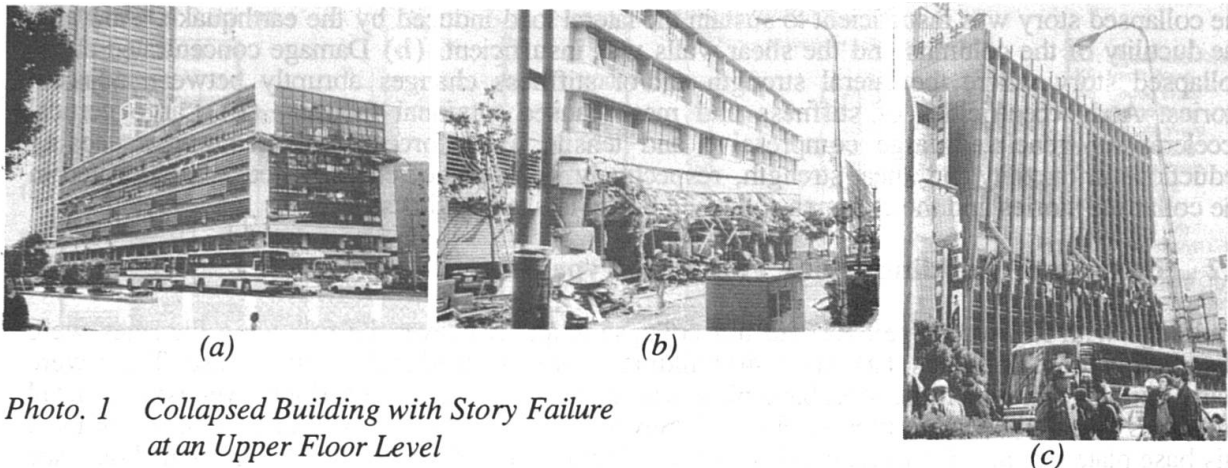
Collapsed Building with Story Failure at an Upper Floor Level
